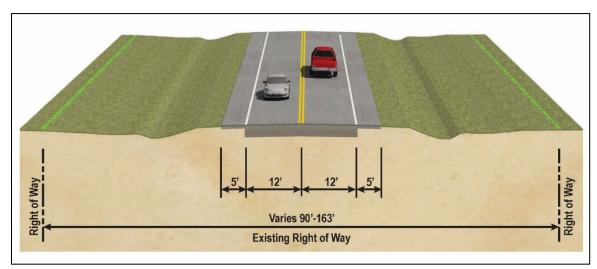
Existing Typical Section – Avenue Y to LaVista Drive.
